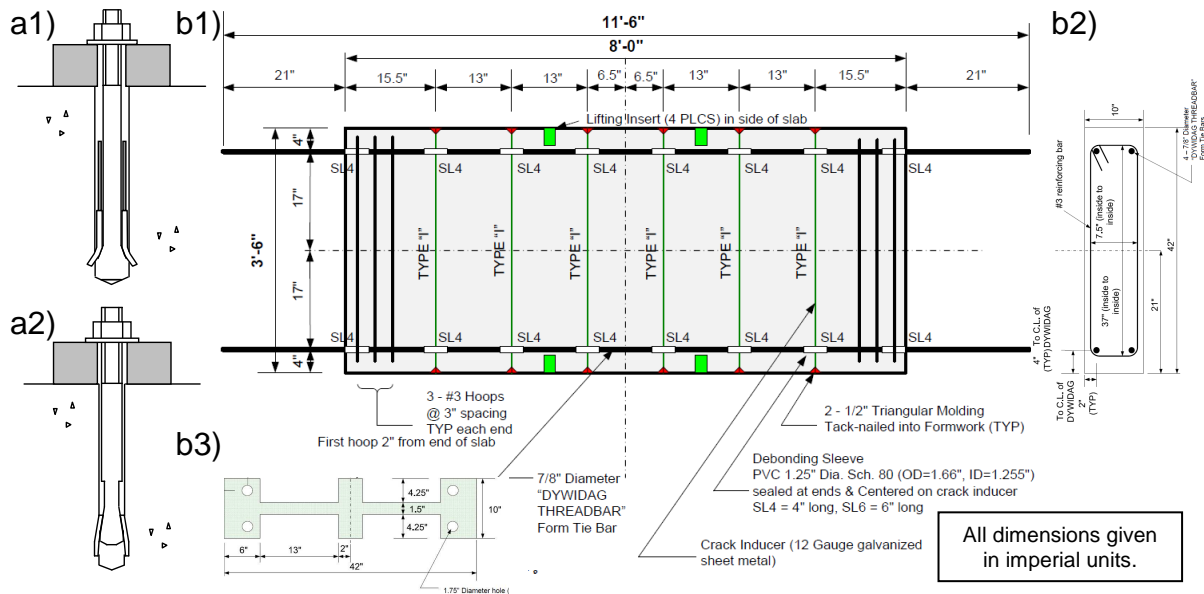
a) Tested anchor types: a1) Undercut anchor UC1 with modified sleeve, a2) Expansion anchor Eab1; b) Concrete slab used for tests: b1) Horizontal section, b2) Cross section; b3) Crack inducer
